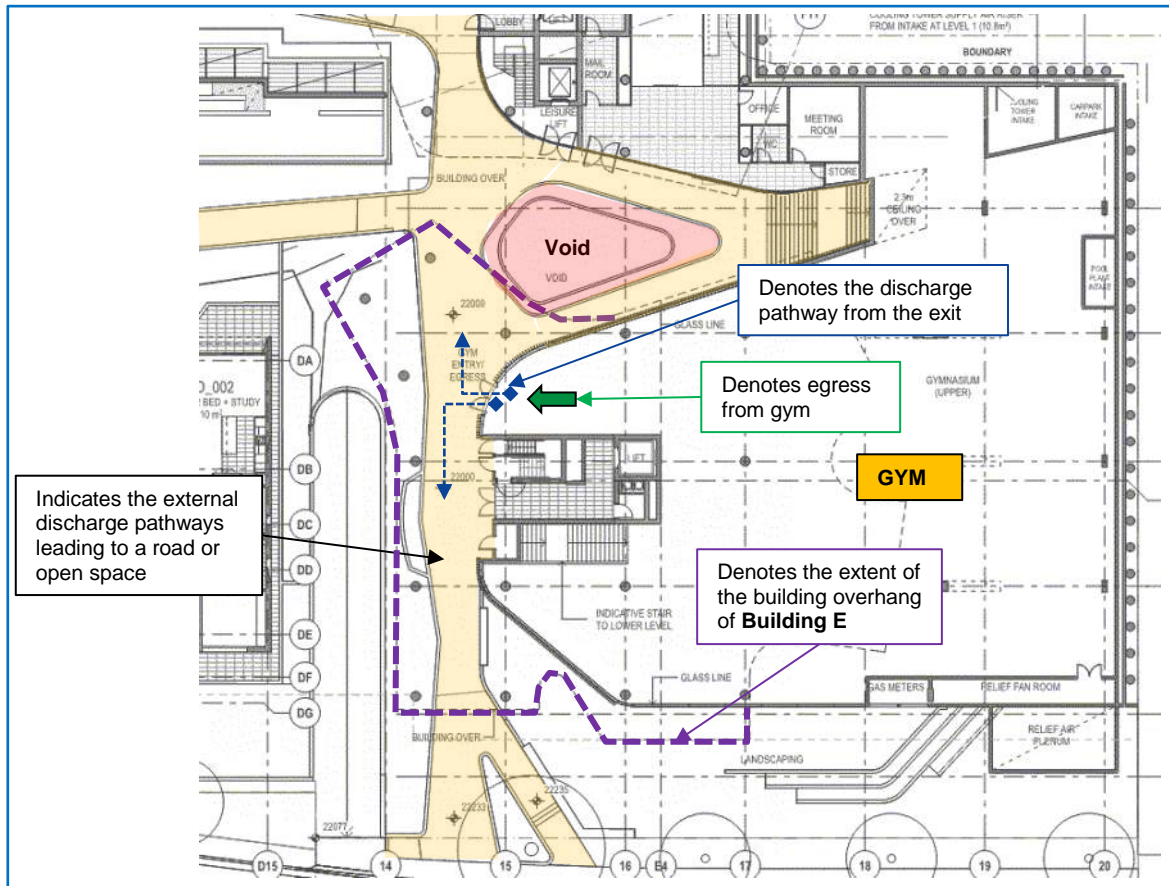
Building E (Upper Ground Floor) – discharge of exits from gym area into a covered space
